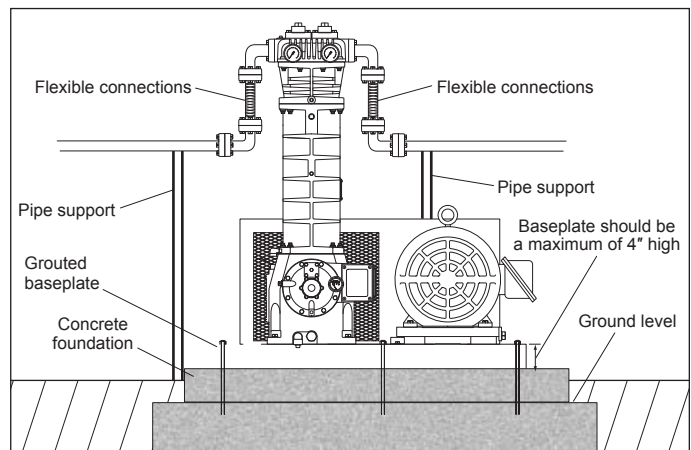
103 mounting shown above. On 107 mountings, the flexible connectors should be located near the four way valve.
